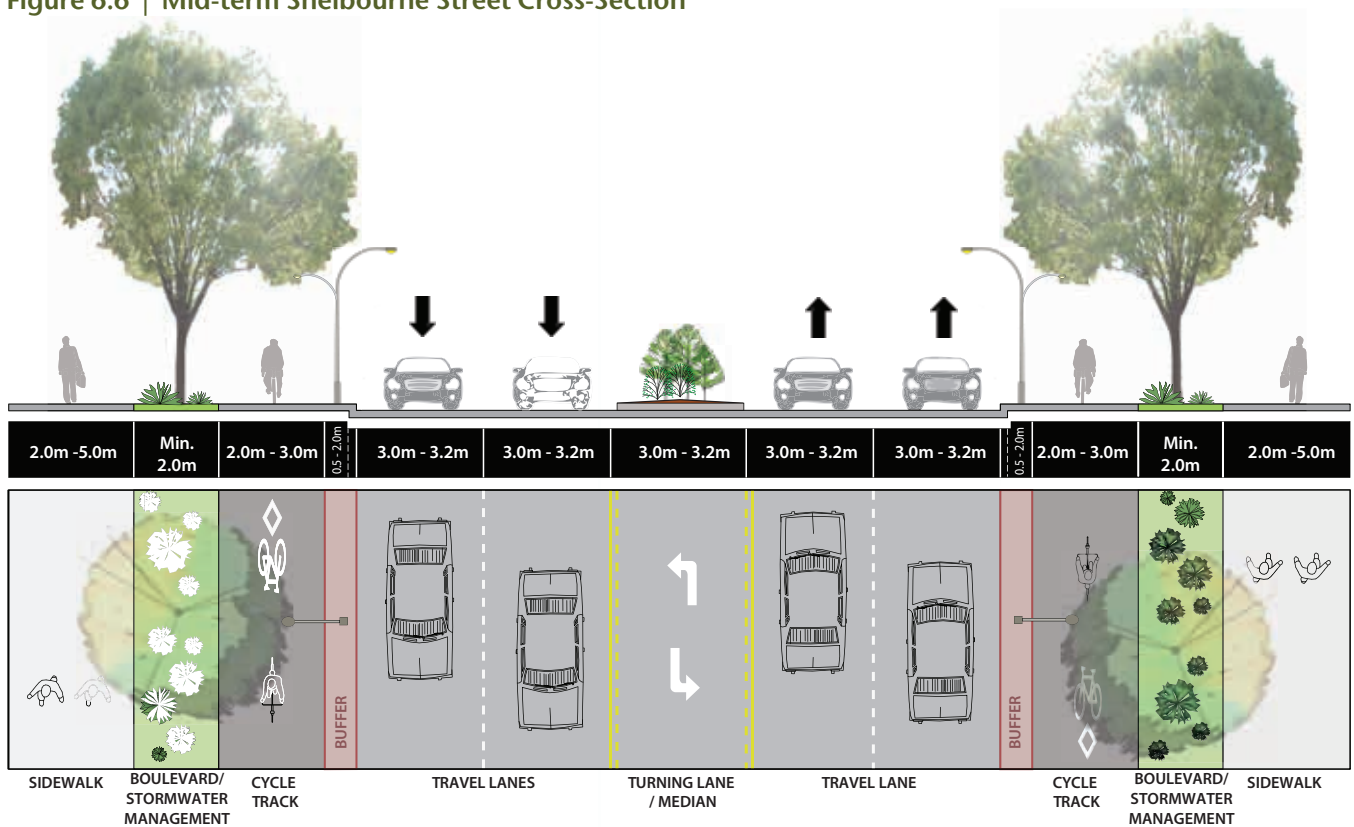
| Mid-term Shelbourne Street Cross-Section with Turn Lane / Landscaped Median
